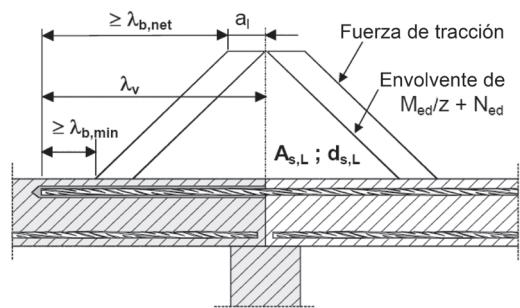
Reinforcement anchor to cover the action line of the tensile force.
